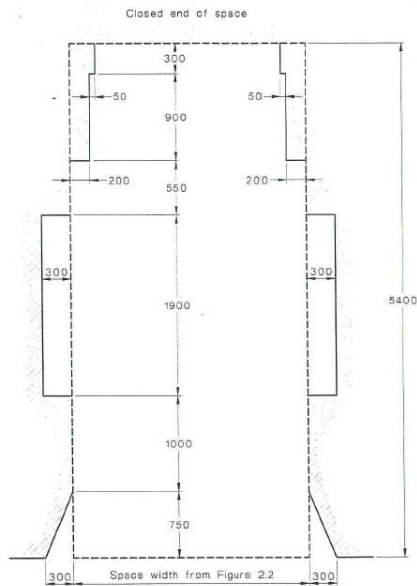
DESIGN ENVELOPE AROUND PARKED VEHICLE TO BE KEPT CLEAR OF COLUMNS, WALLS AND OBSTRUCTIONS
